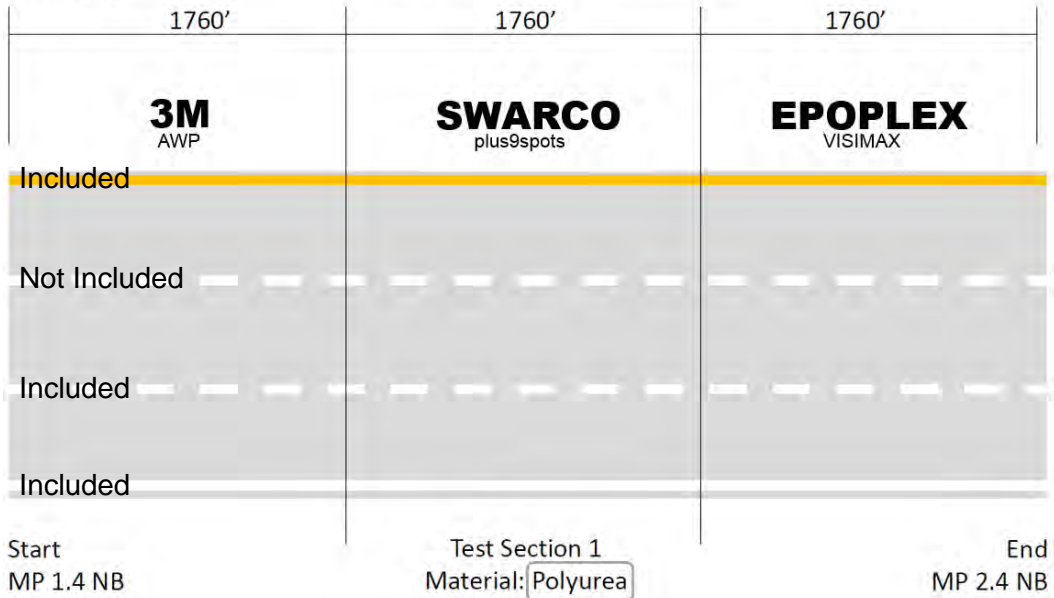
Test deck installation photo and locations for the I-355 tollway.
